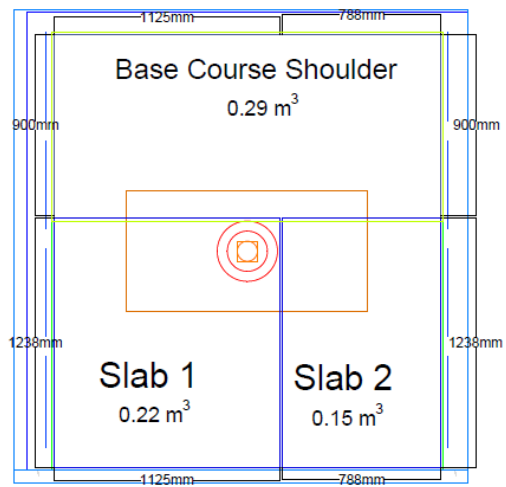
Large Box Layout with Concrete Slabs (Top View)
